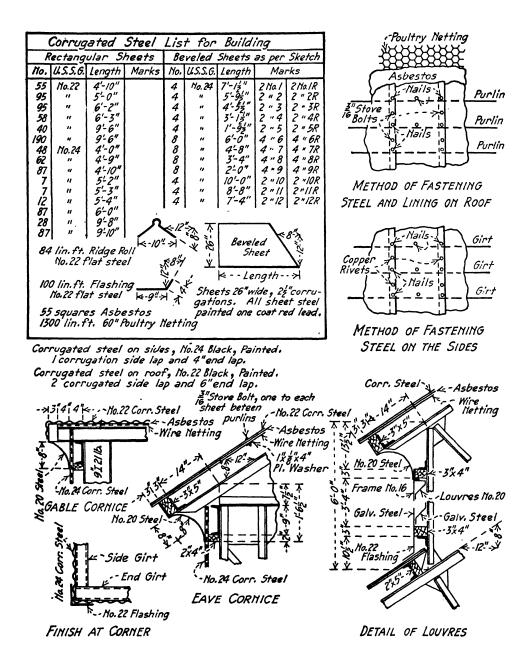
CORRUGATED STEEL LIST AND DETAILS FOR TRANSFORMER BUILDING.
